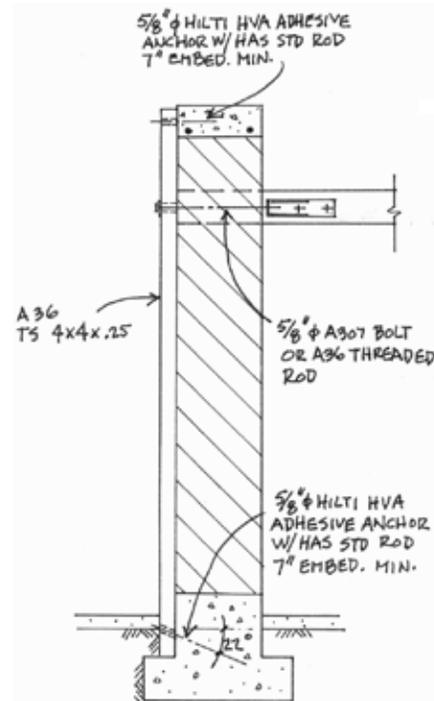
Typical wall section of the Shafter Courthouse, showing continuity hardware interconnecting discontinuous bond beams.
